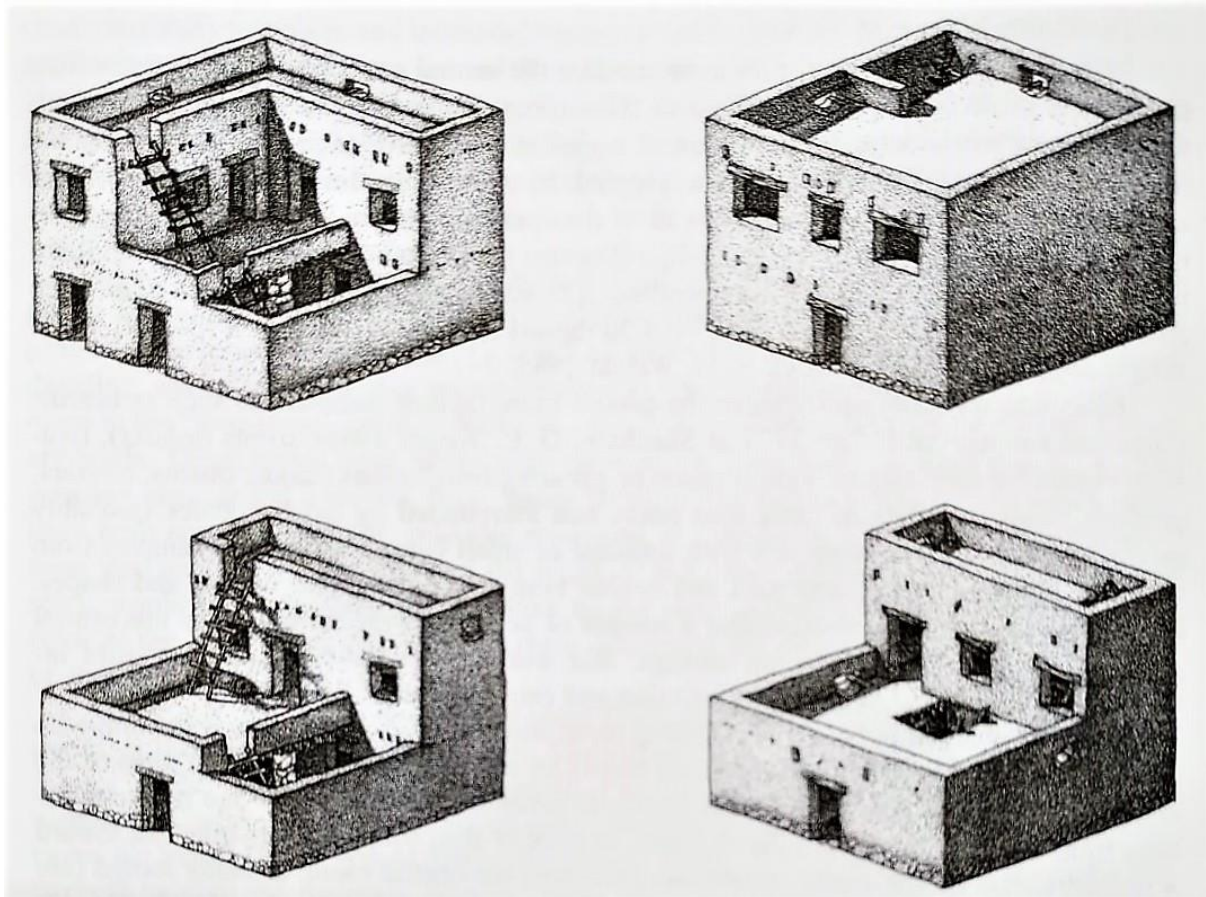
Four different possible reconstructions of the Iron Age II pillared house at Tell Halif (Israel) (Hardin 2010: 52, figure 3.2).
